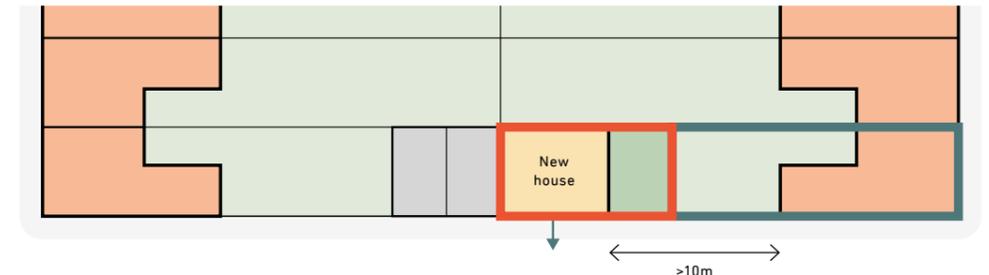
A new development can replace street-facing garages or outbuildings, providing that a minimum distance of 10m from the rear of the existing house on the site is maintained.
